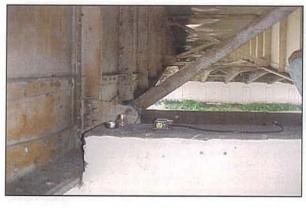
Sensor Location B, off center on top of Pier P2
